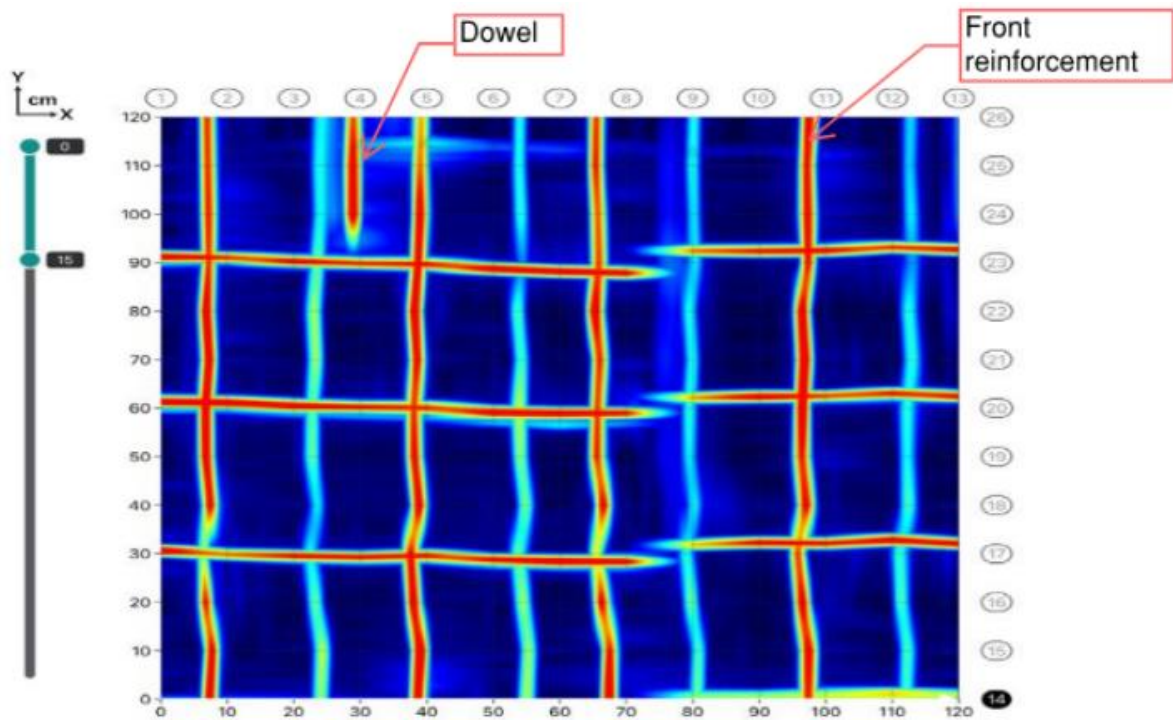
Sample of GPR Scan results for a precast cross wall in Charleton House
